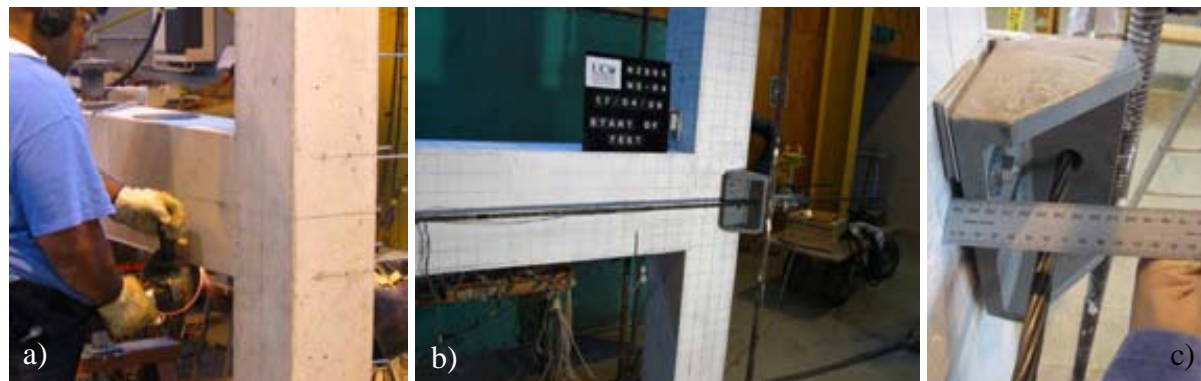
a) Beam weakening for NS-R4 was 310mm away from the column centre-line; b) NS-R4 with beam weakening and external post-tensioning retrofit interventions; c) the post-tensioning tendon was 60mm from the beam face.
